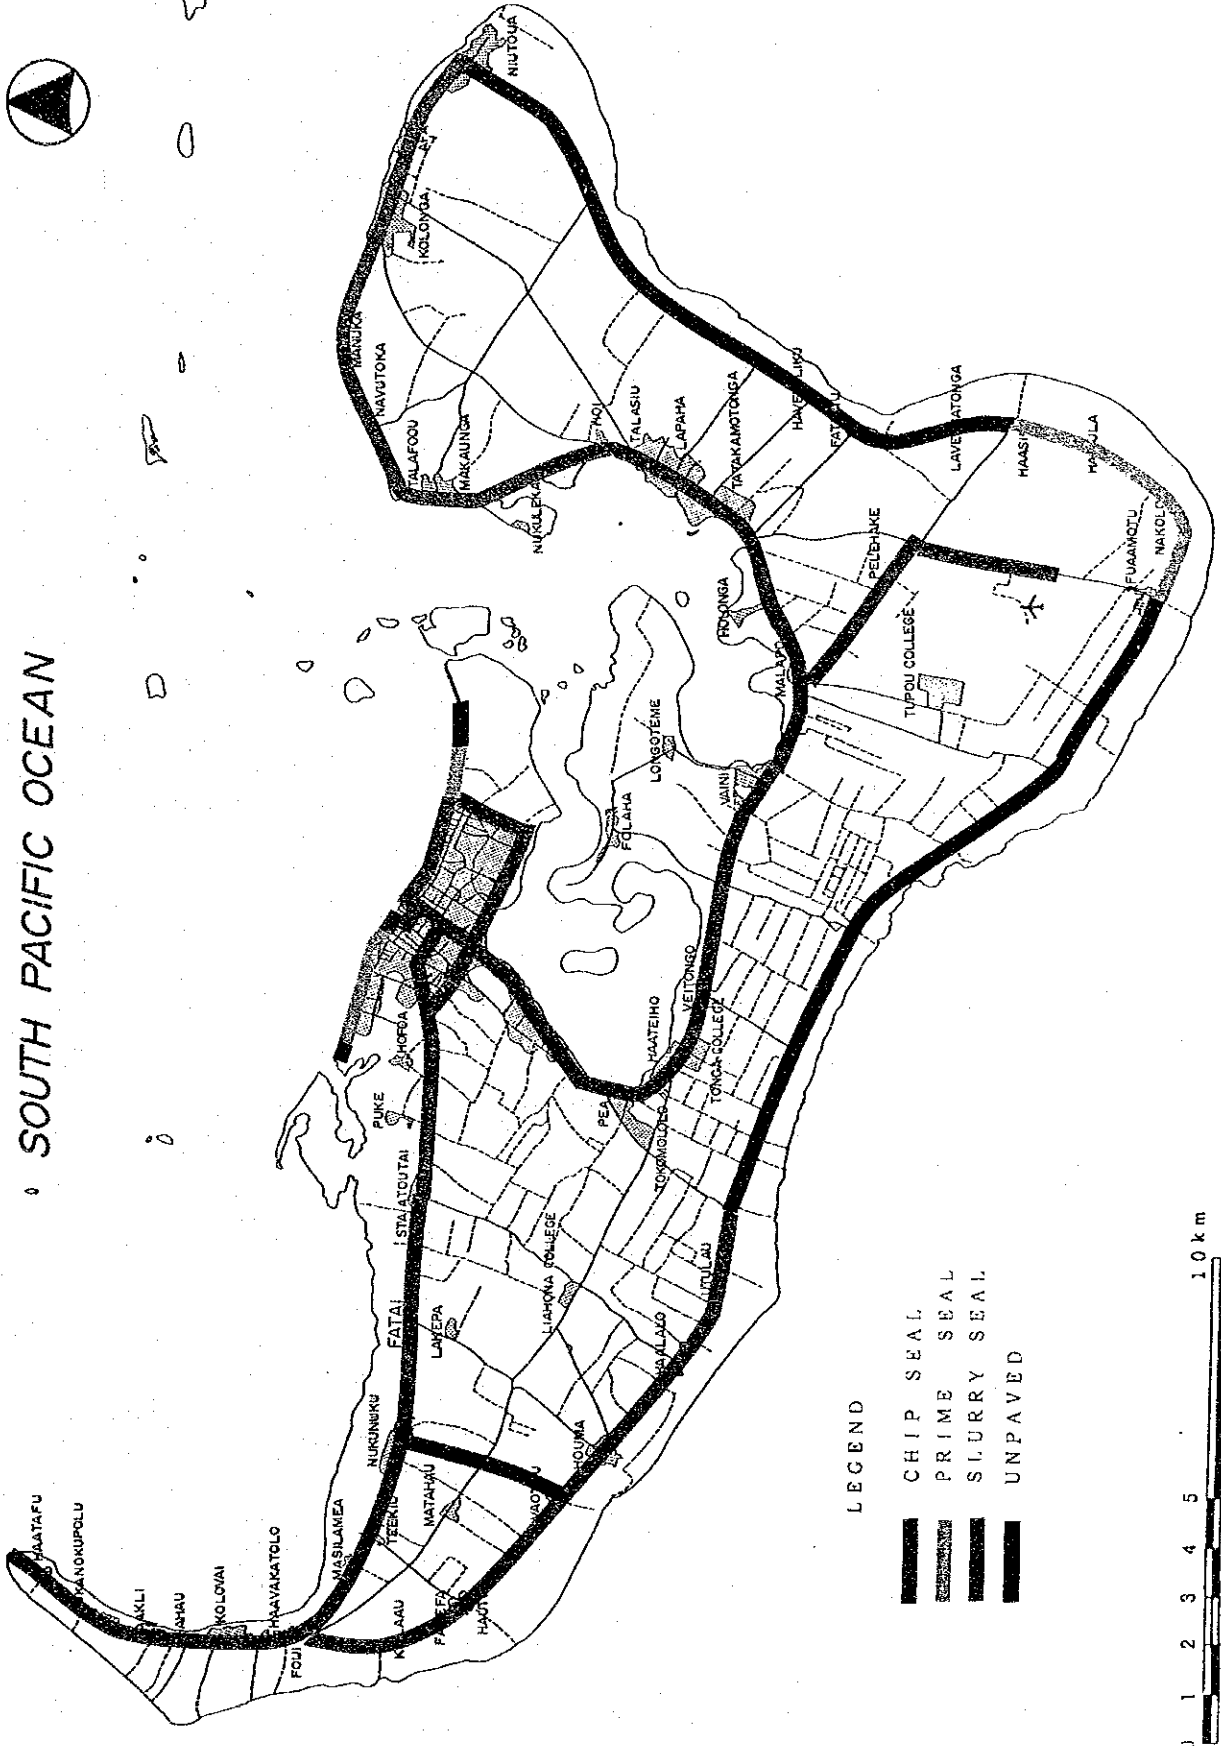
EXISTING PAVEMENT TYPE OF REQUESTED ROADS
